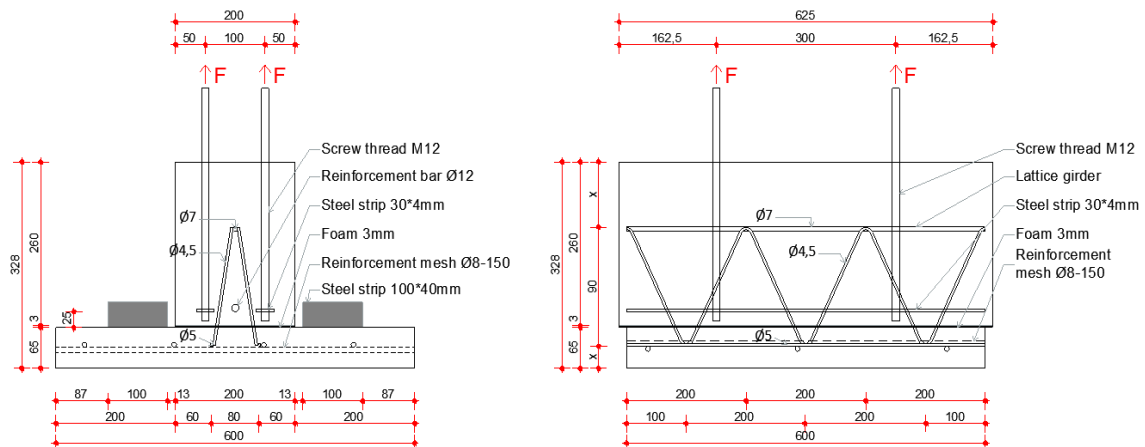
Cross-section of the specimen (left) and longitudinal section of the specimen (right) [14]
